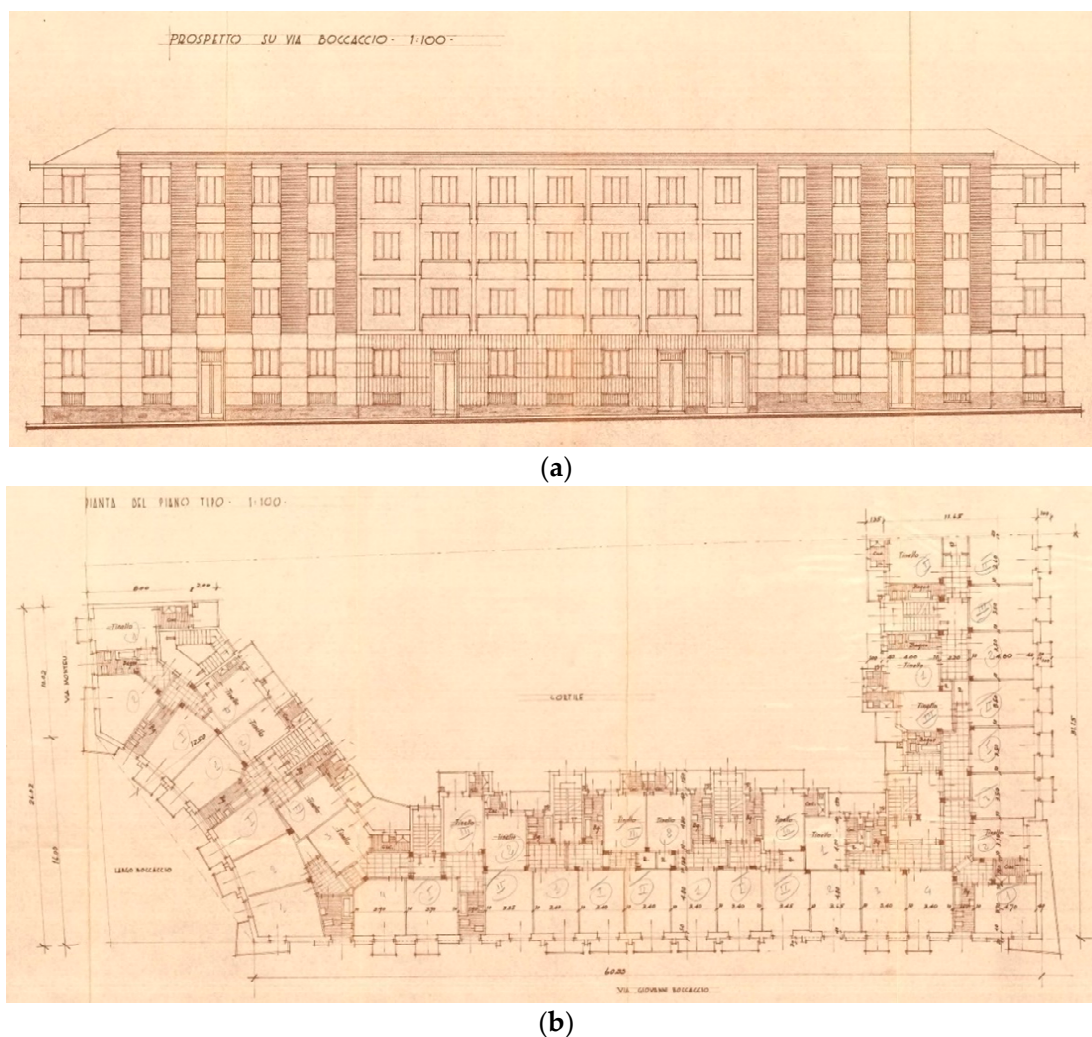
Case study building. (a) Main façade; (b) model floor plan [29].
